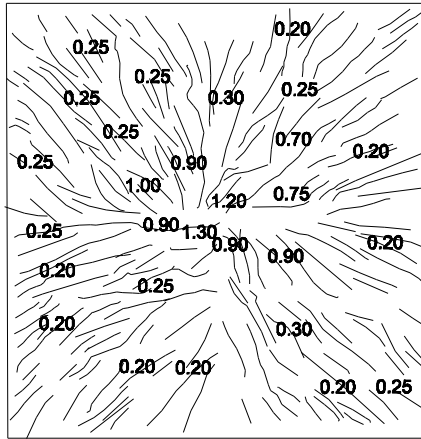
Tension face of specimen SY200f15-a after testing (Numbers indicate crack widths in millimeters)
